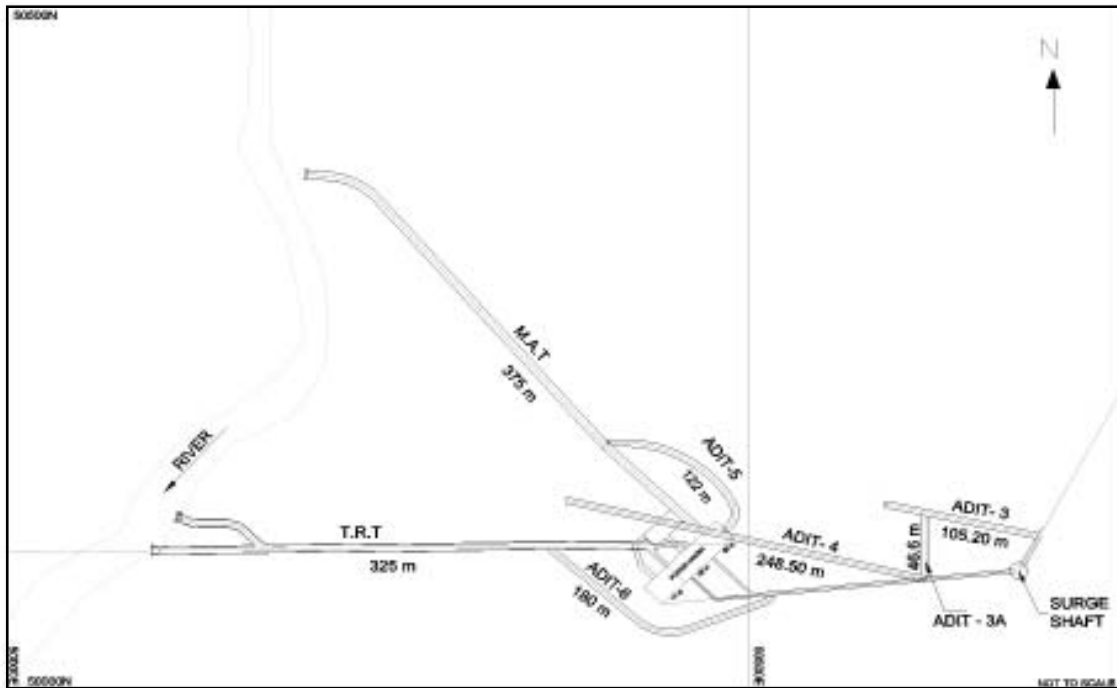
Layout Plan of Power House Malana Hydroelectric Project.
